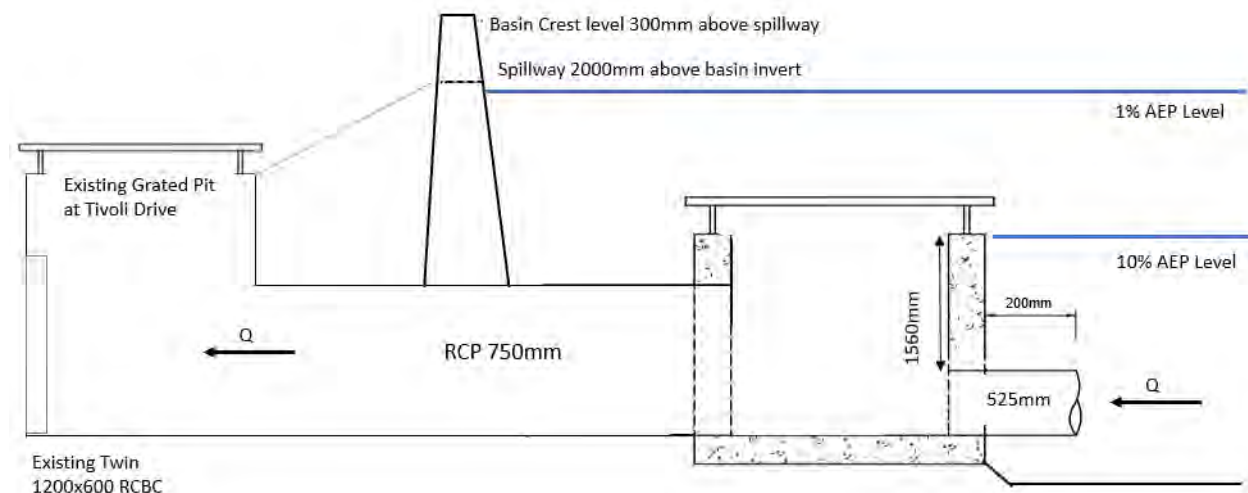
SCHEMATIC OF BASIN OUTFALL AND PIPED CONNECTION AT TIVOLI DRIVE
